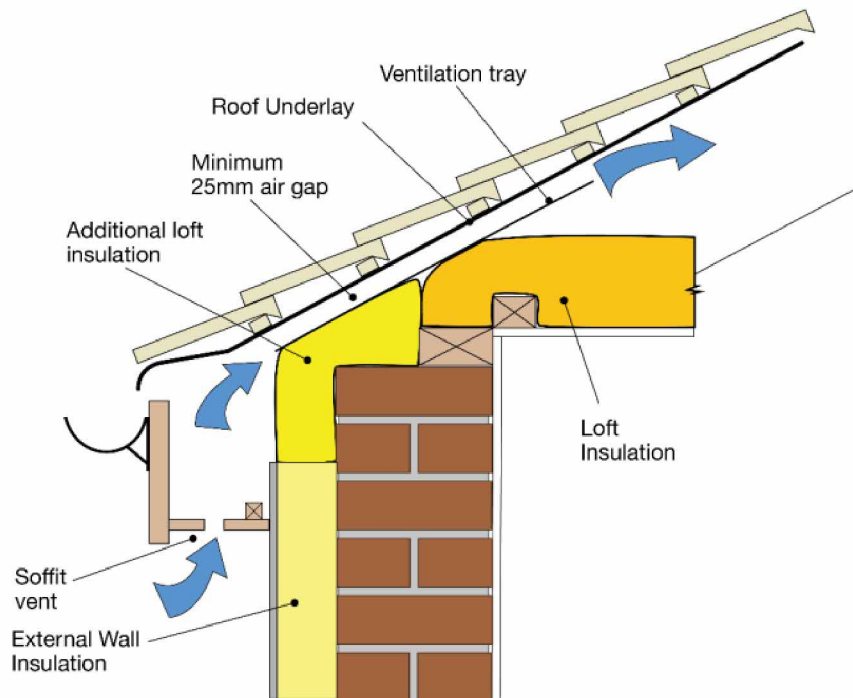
Standard Eaves with Roofline Extension to provide suitable overhang whilst maintaining adequate loft ventilation with additional loft insulation added to mitigate the thermal bridge on the outer brick leaf.
